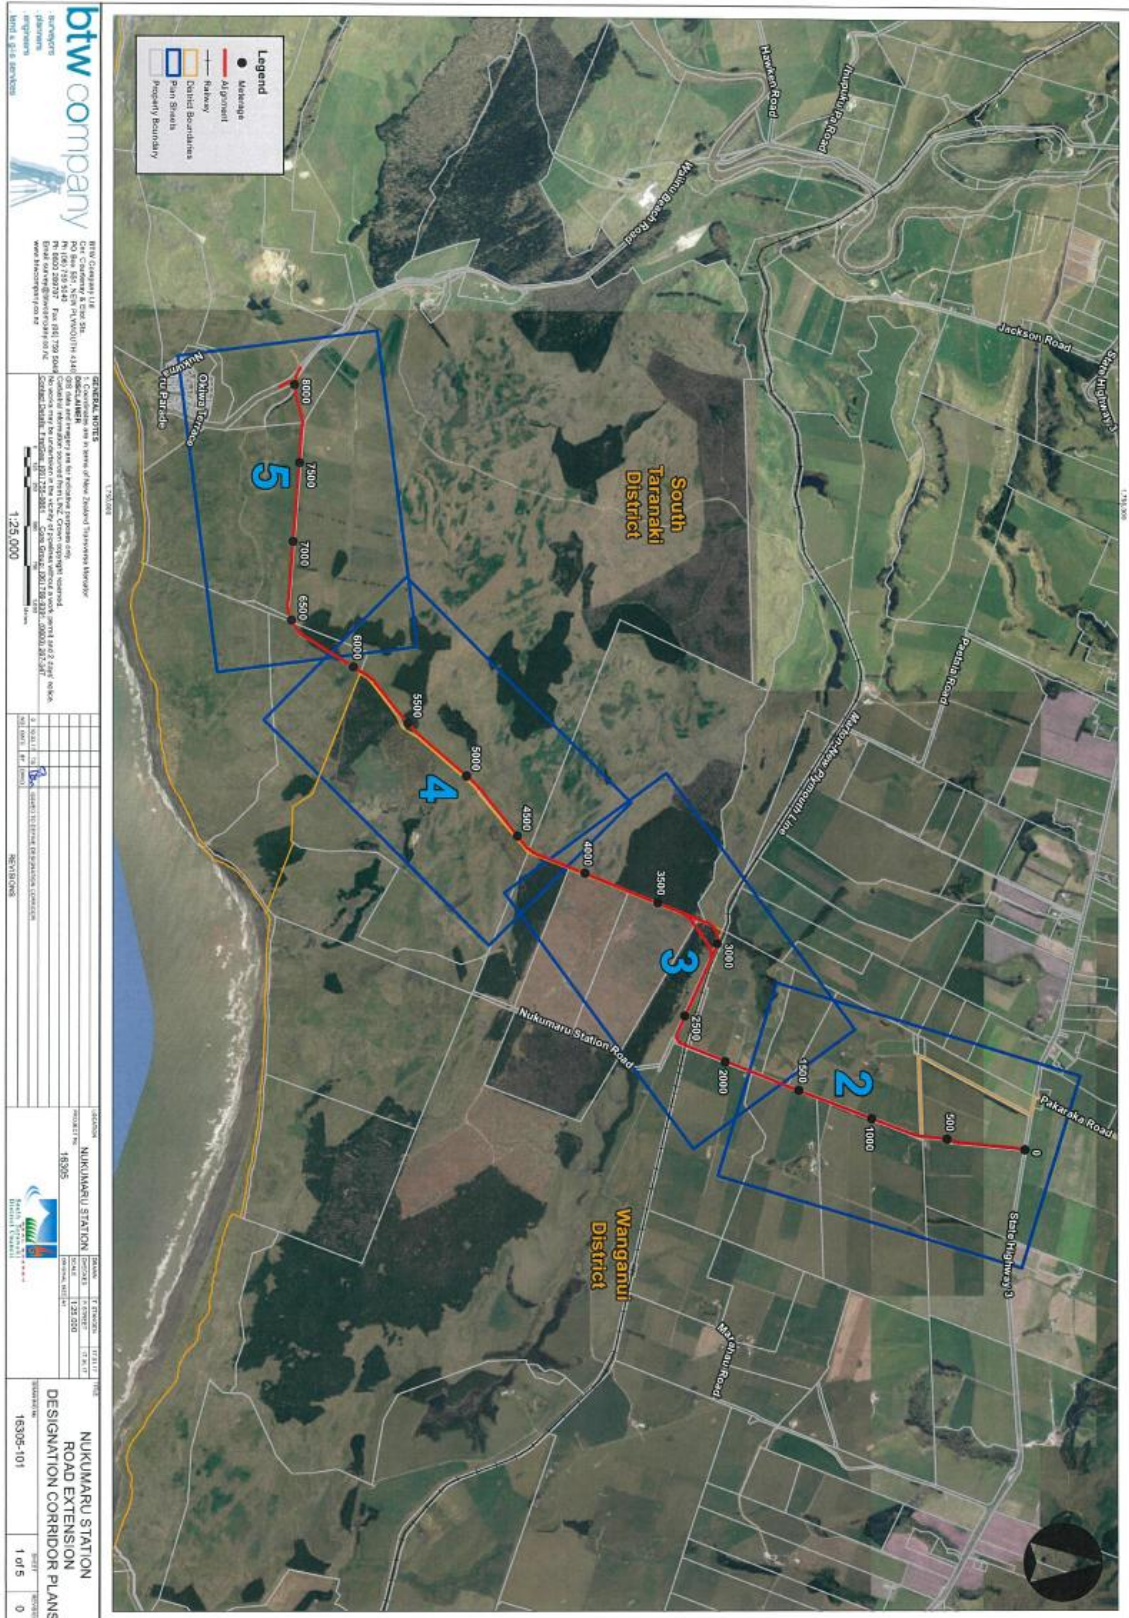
Detailed plan showing the proposed Nukumarū Station Road alignment as assessed. Plans 2 - 5 are included in the appendix of this report.
